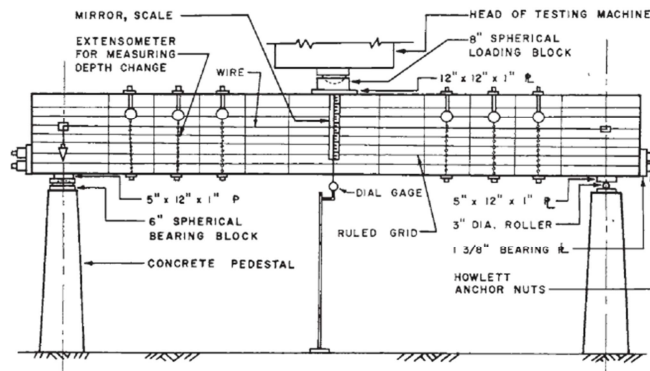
Loading arrangement and instrumentation, Bresler and Scordelis[43]
